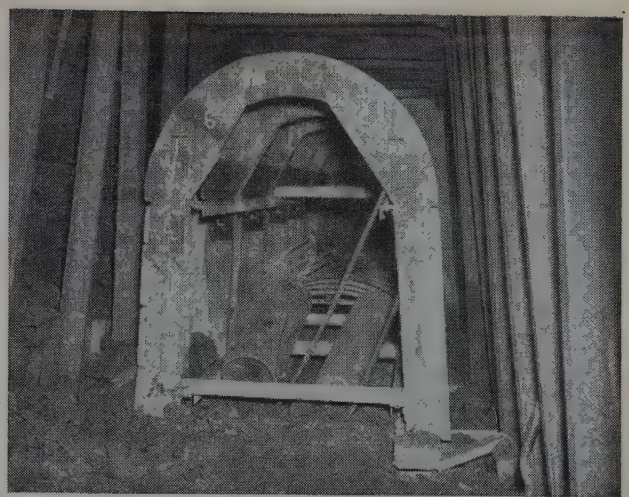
Rail sets installed in place of timber and concrete forms placed.
